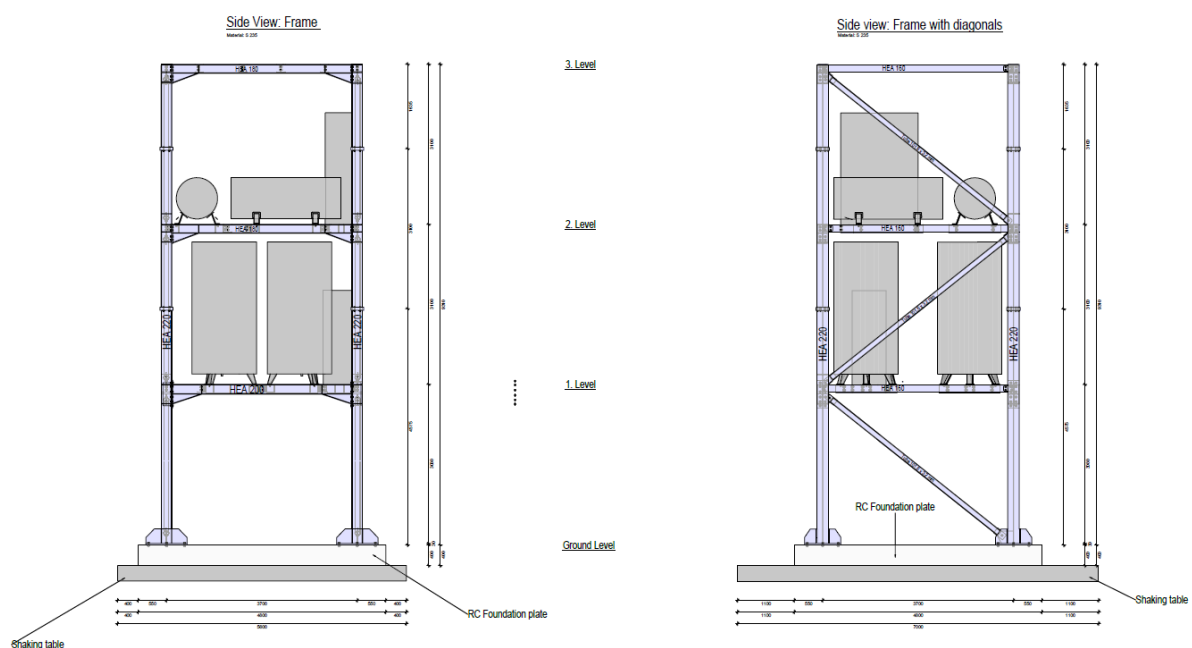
Plan views of the three-storey steel frame (further details: Annex C)
